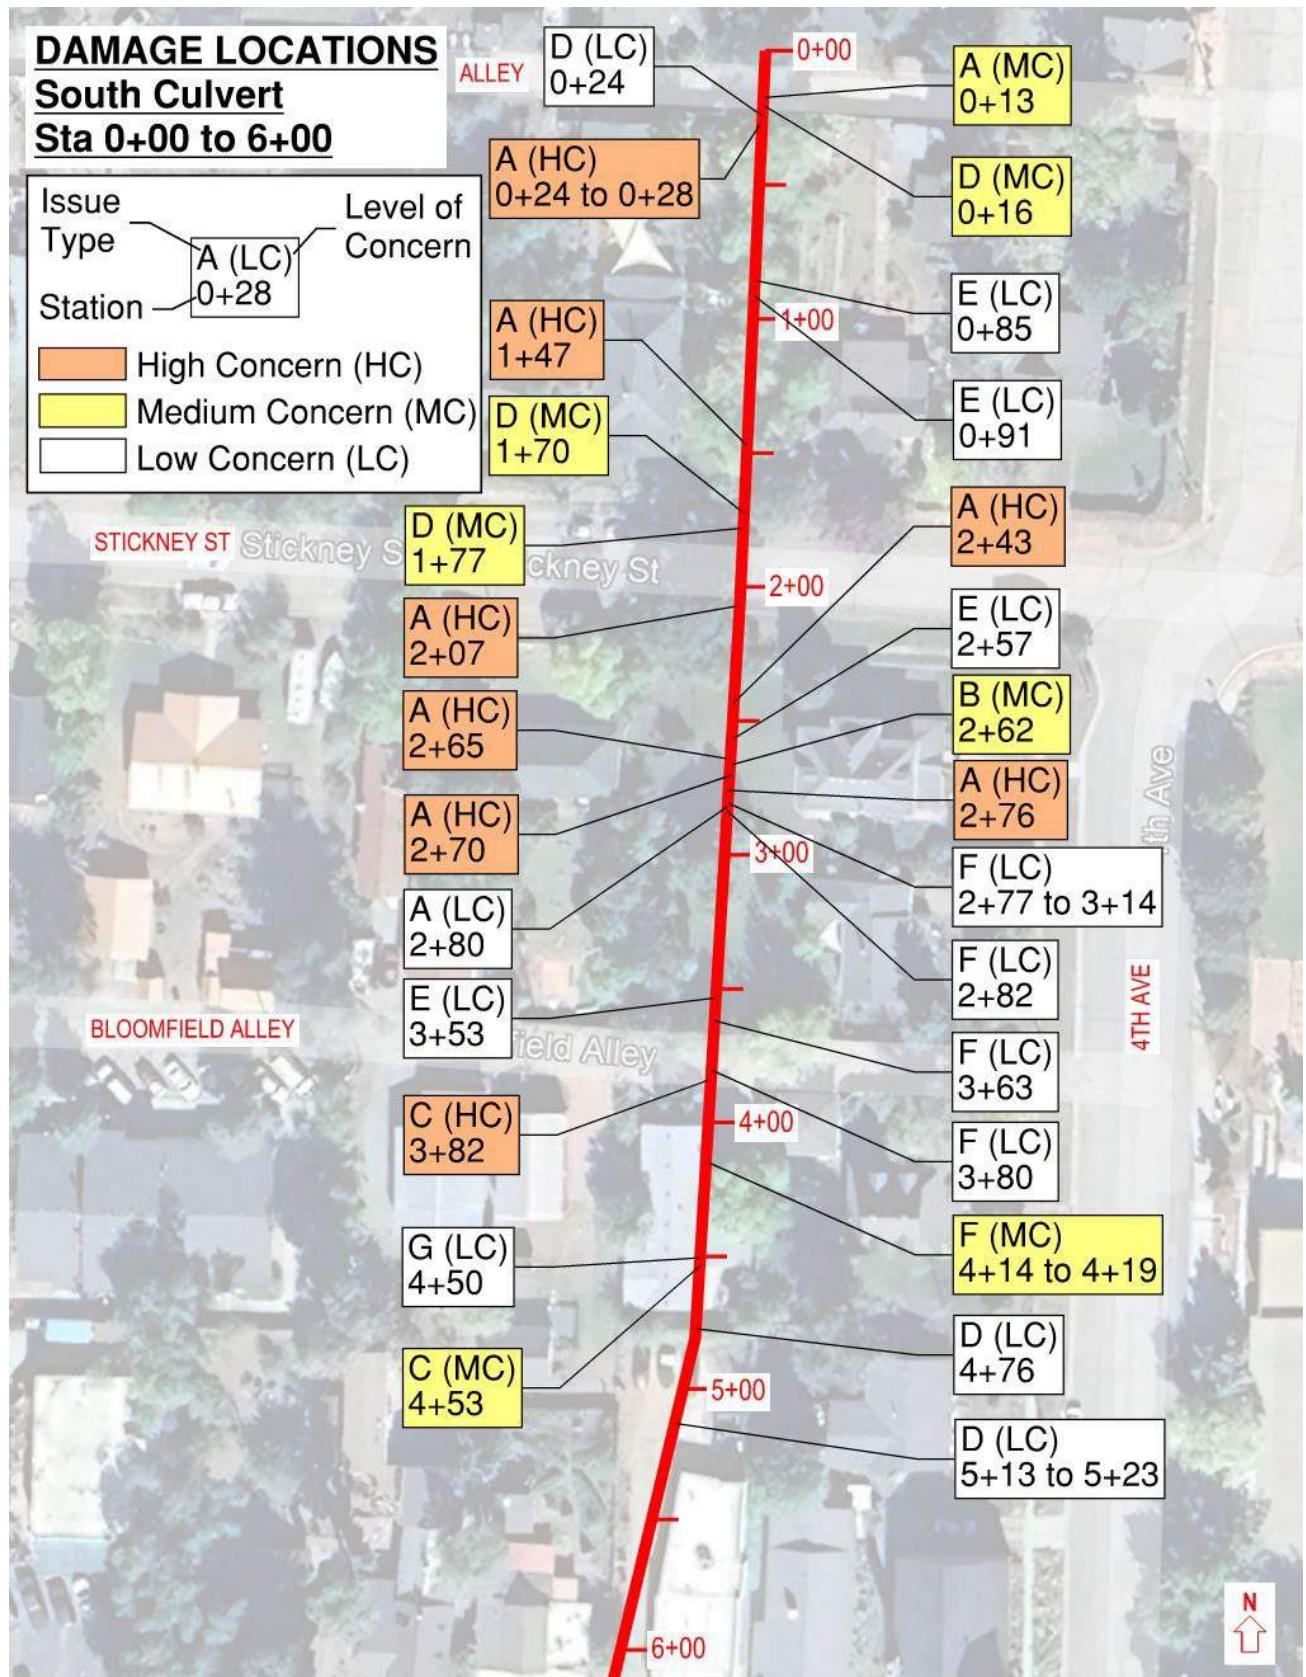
South Culvert Map of Damaged/Deteriorated Areas Stations (S)0+00 to (S)6+00
